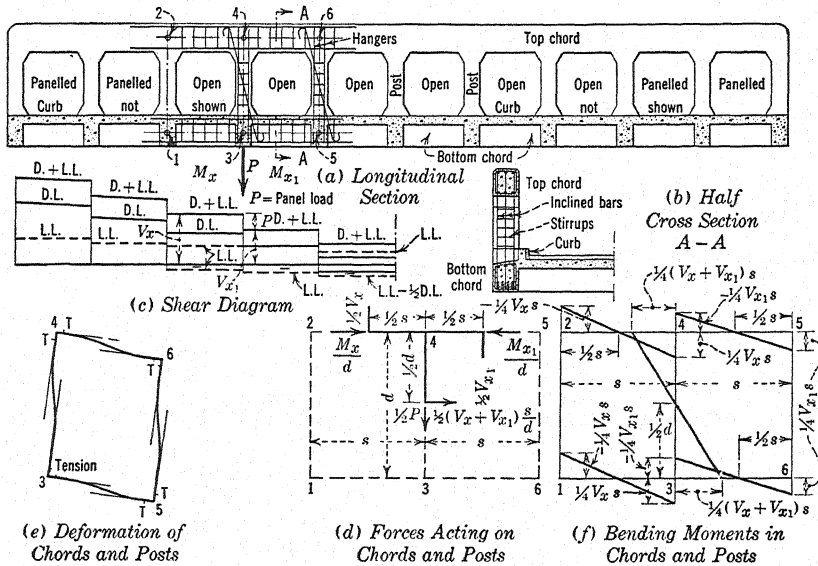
Through Girder with Open Web. (See p. 111.)
